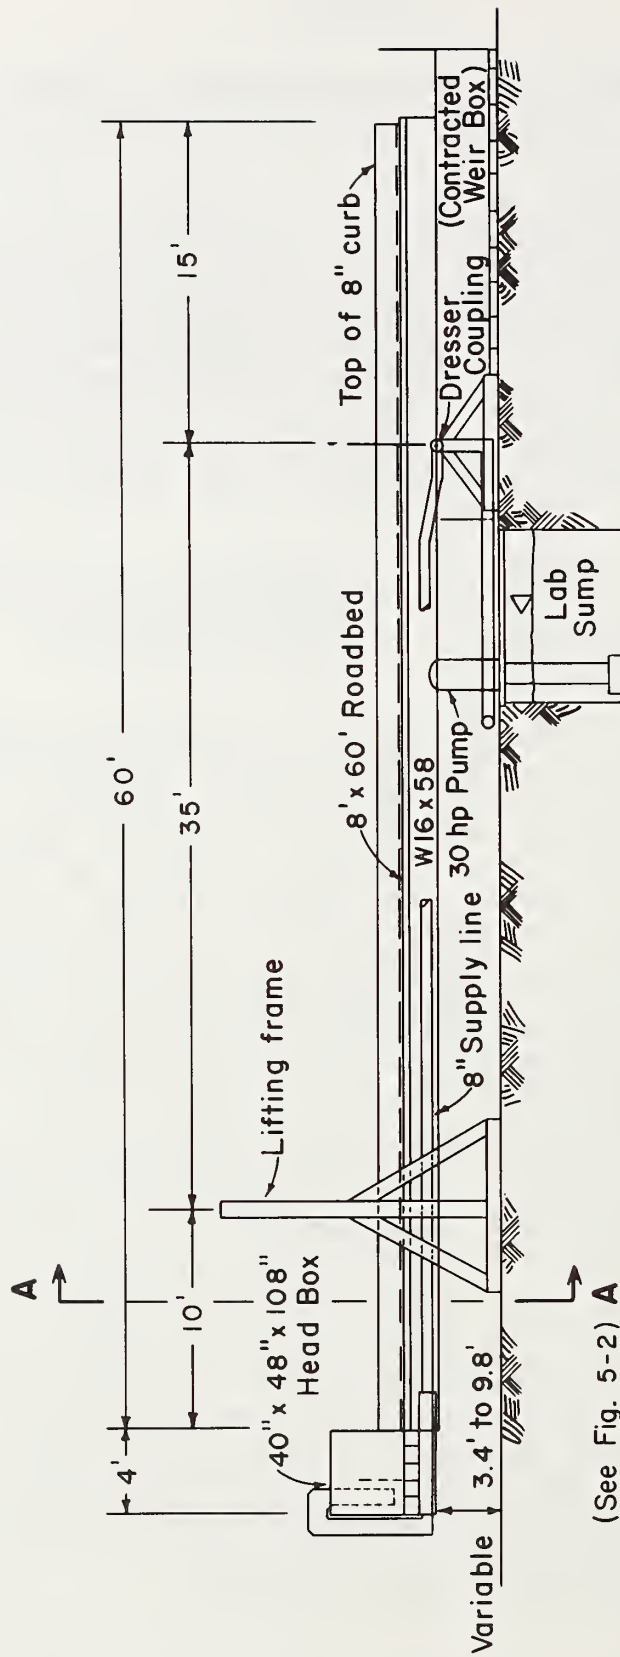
Hydraulic test facility elevation view (schematic)
